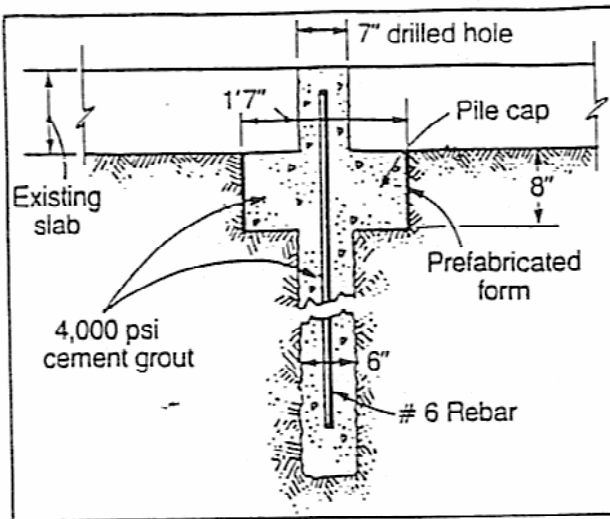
Schematic arrangement of 35' long, 15 ton pinpile and existing base slab. Coney Island, N.Y. (Munfakh and Soliman, 1987).
